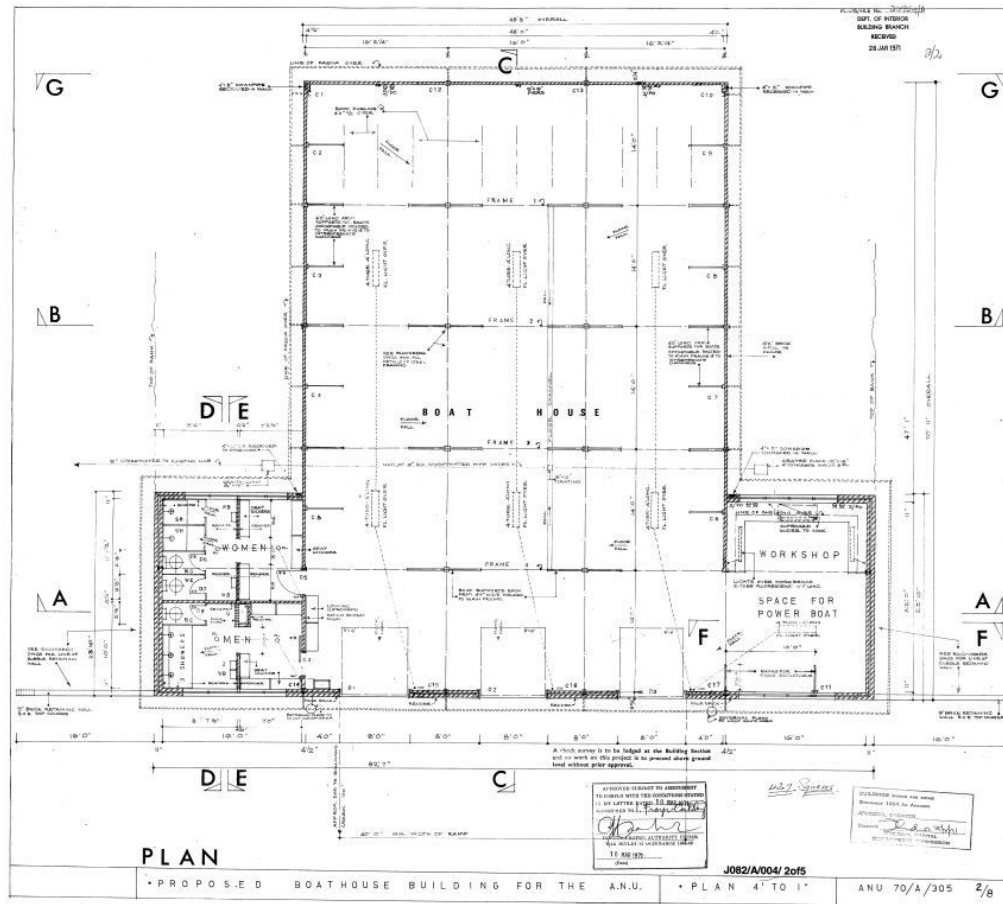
The proposed plans for the Boathouse building for the ANU Boat Club, 1971. (Source: ANU Drawings Office)
